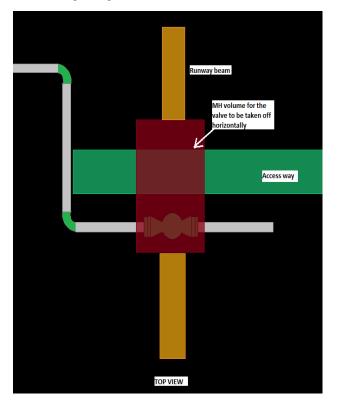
(a). Top View of MH head clearance requirement for valve removal
